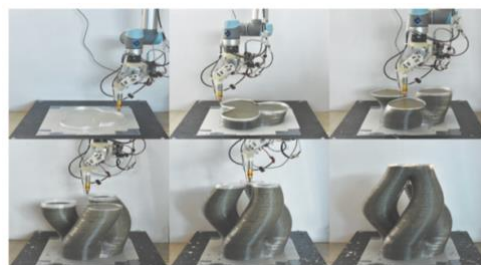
Construction of concrete column with three branches using the eggshell fabrication process [15].
